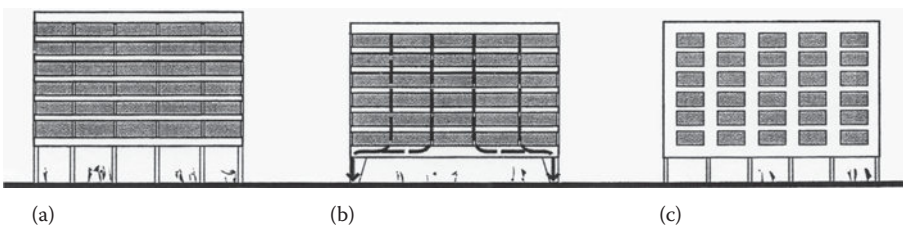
Three types of soft first story: (a) flexible first floor, (b) discontinuity—indirect load path—and (c) heavy superstructure.
